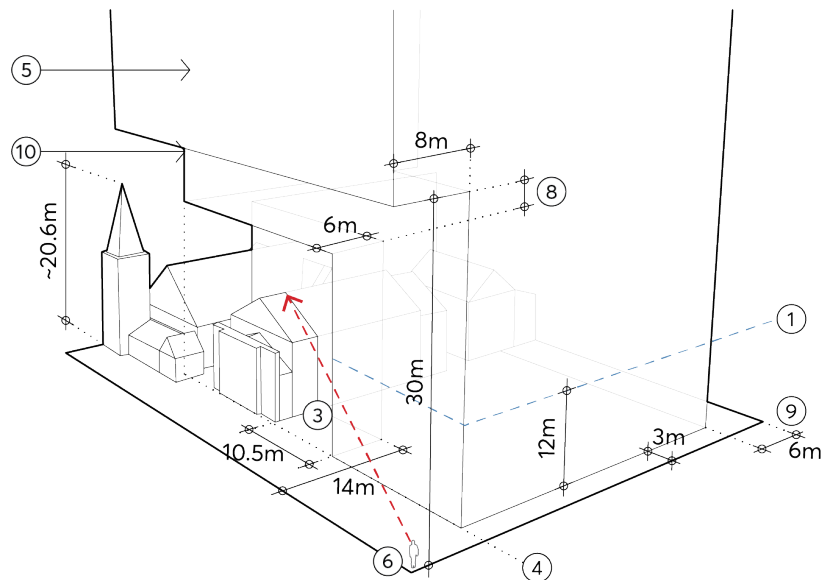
Existing elevations with new building guidelines (Source: TKD Architects with base drawing from Paul Davies)
